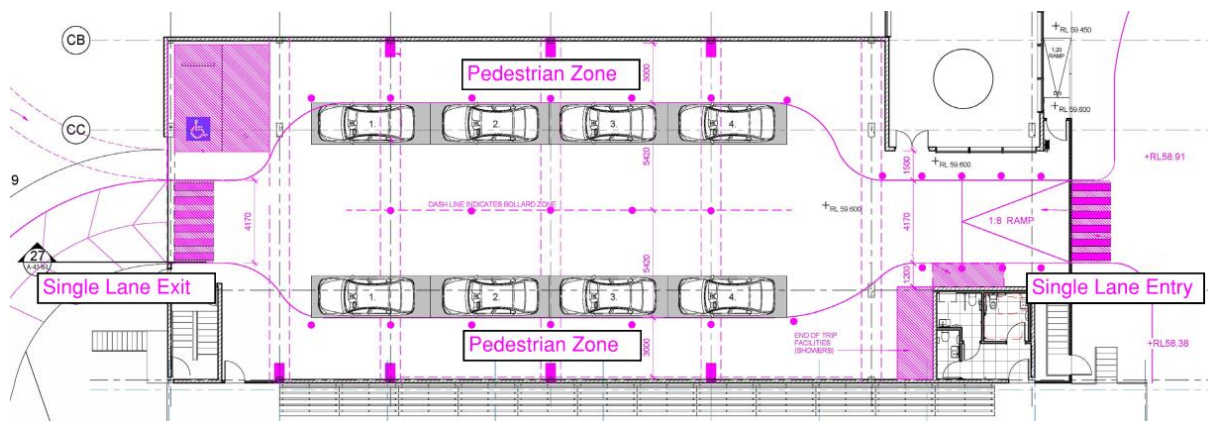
Internal Layout of Proposed Drop Off Facility (Source: Cox Richardson, February 2017)
